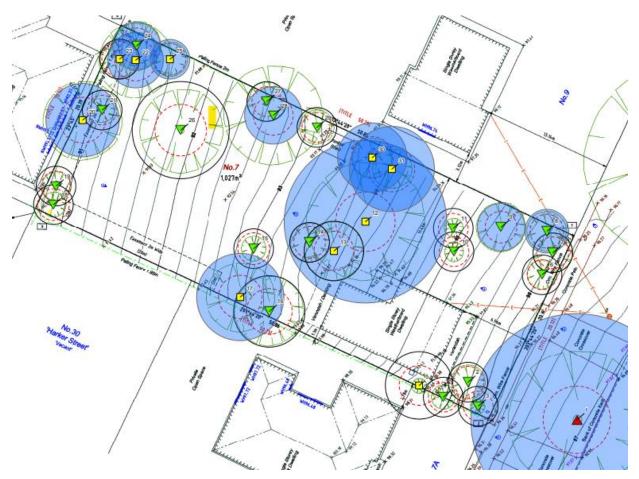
Tree Protection Plan (refer to Attachment 6 for further details)
